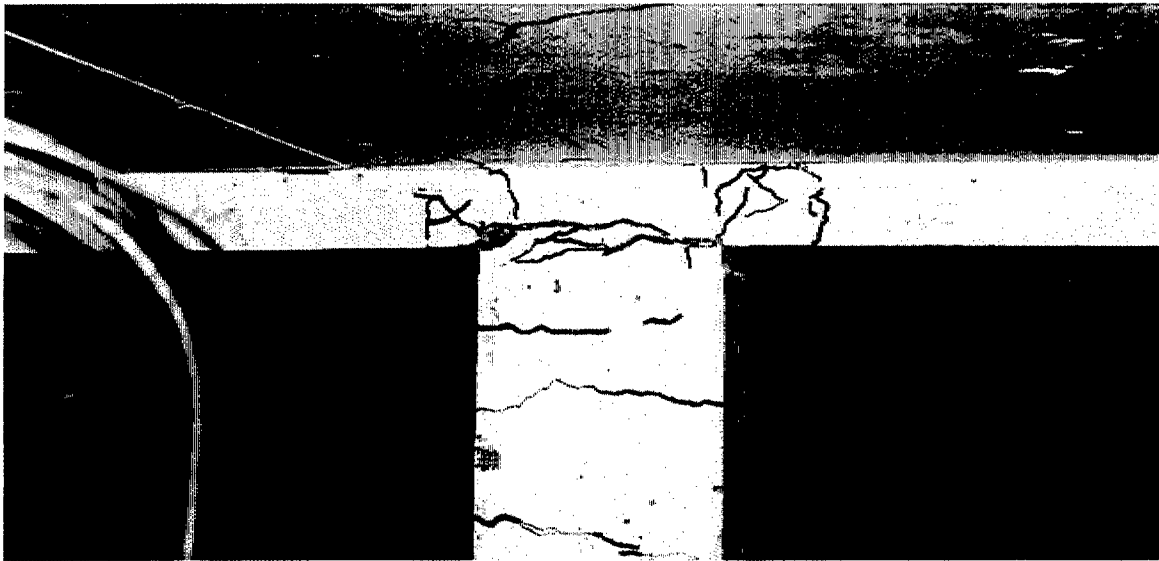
Bottom of Third Floor Slab at NE Column, Post-E200N
